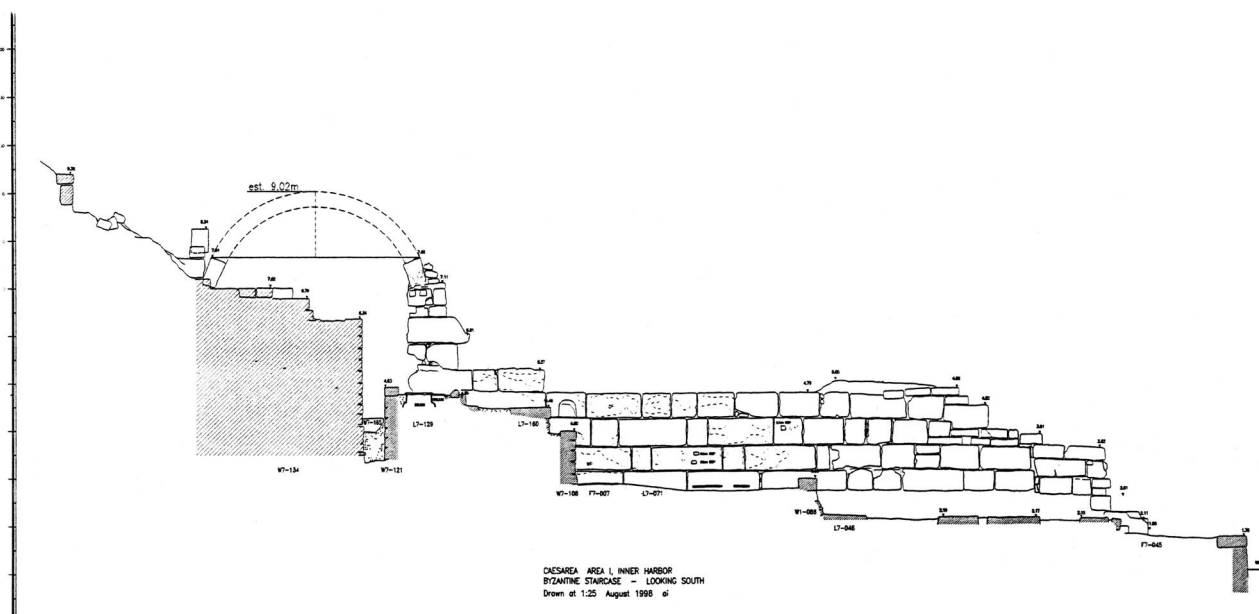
E-W elevation of the northern side of the staircase (A. Raban, Caesarea Project)
